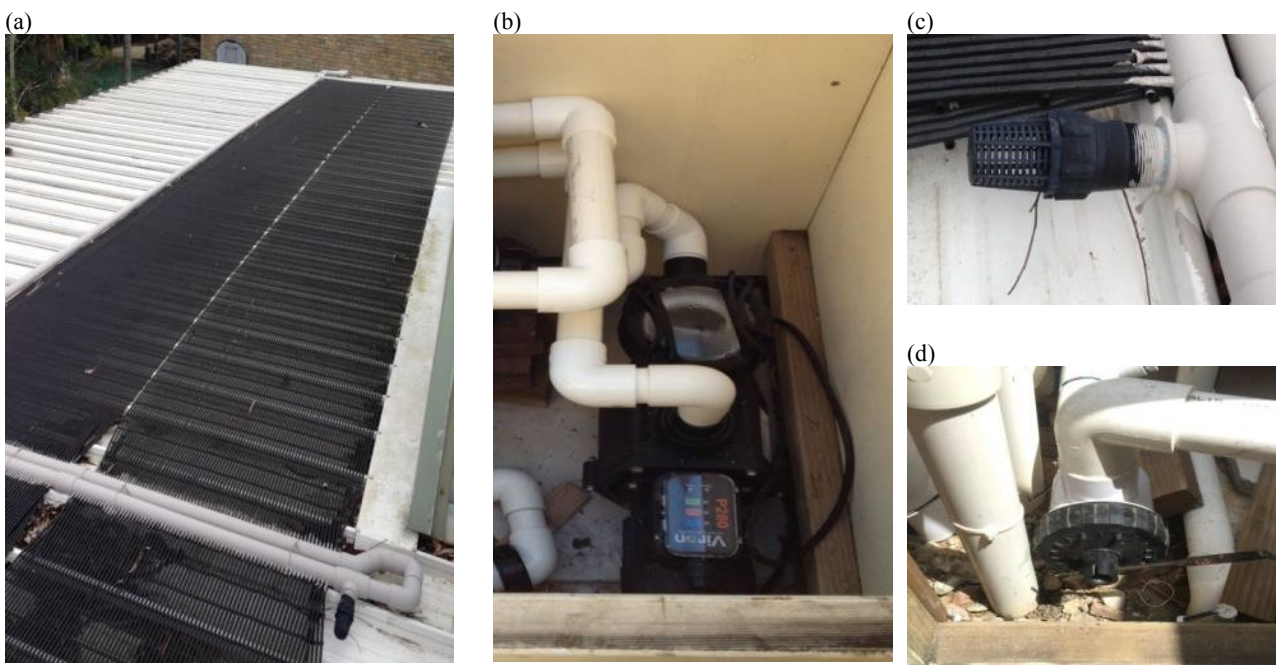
(a) unglazed solar collector, (b) Viron P280 3-speed water pump, (c) vacuum relief valve, (d) throttle valve.
